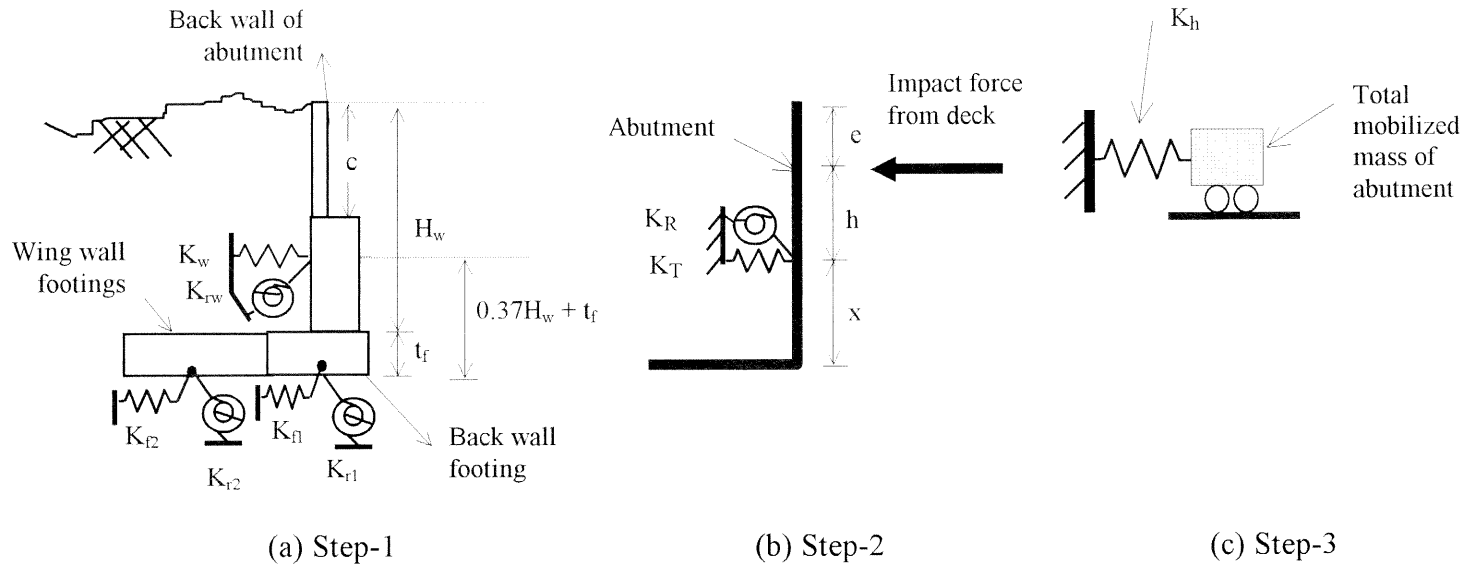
Abutment Simplified Modeling in Bridge Longitudinal Direction
